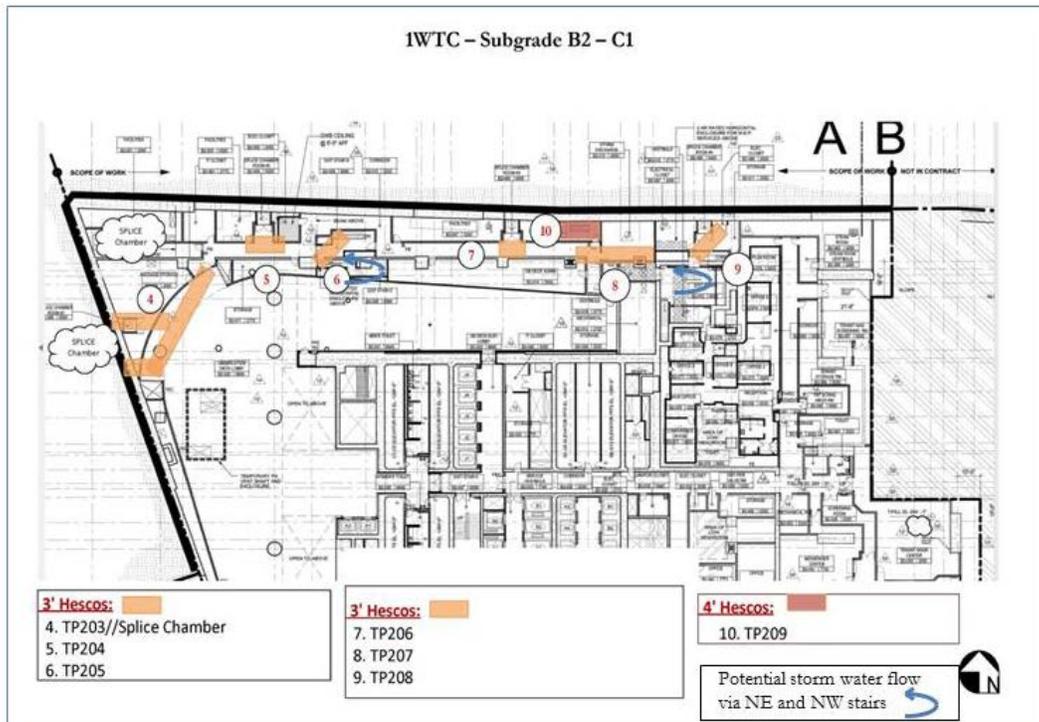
Subgrade Barrier Plan for 1WTC, Floor C1
